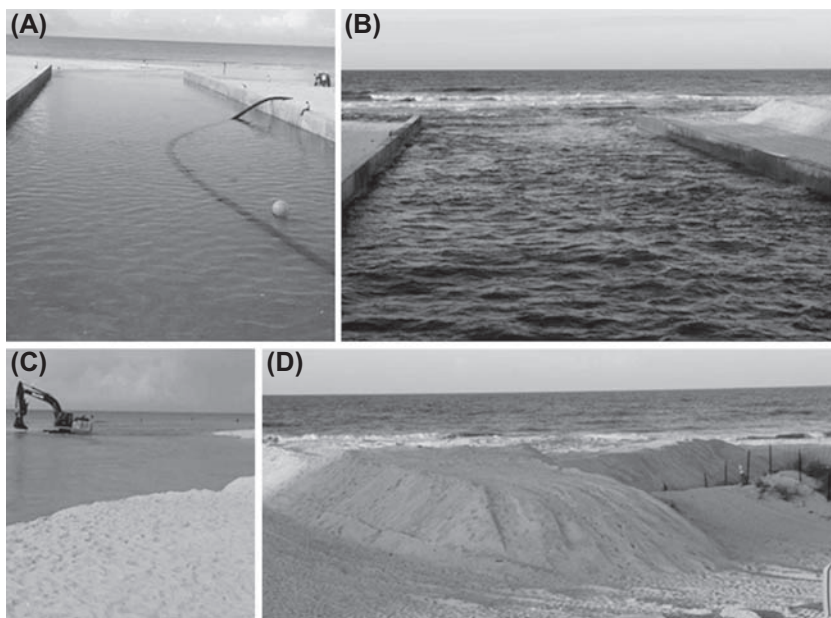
Stages of the excavation project completed at the mouth of Lagoon Pass in June 2015: (A) inlet before excavation; (B) inlet after excavation; (C) long-arm excavator removing sand from the inlet; and (D) excavated sand deposits.
